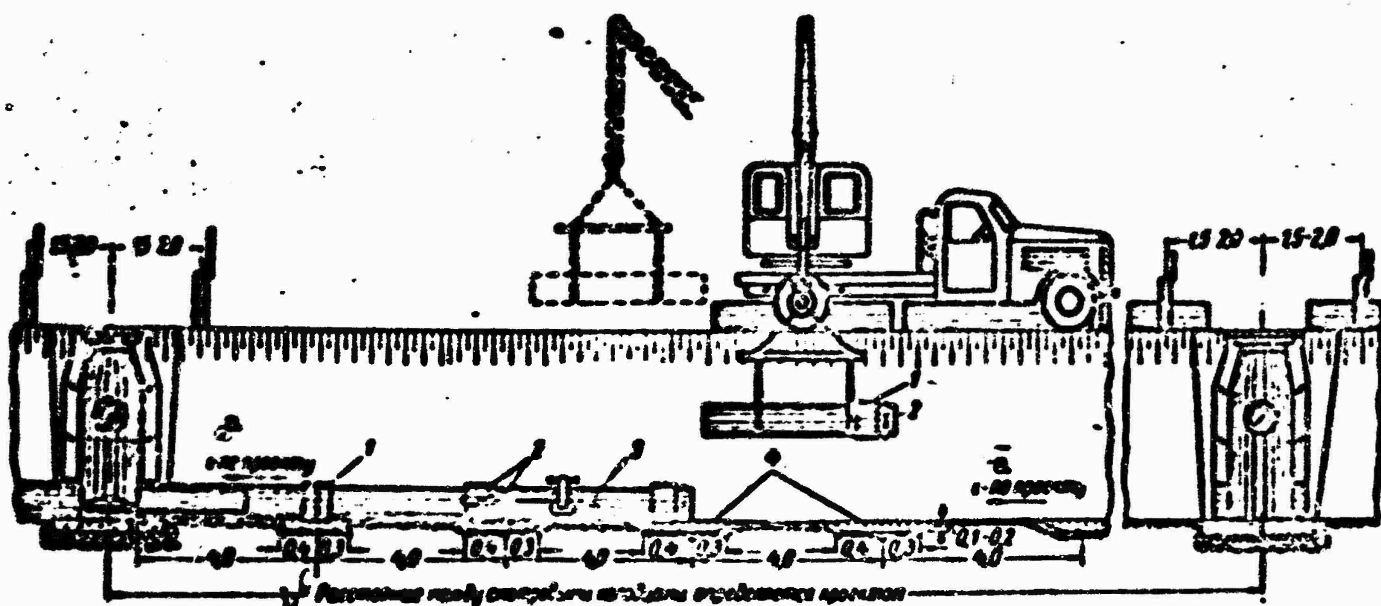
Lowering of a pipe into a trench by a truck crane (the trench walls are not braced). 1) Union; 2) rubber rings; 3) tightening screw jack; 4) holes for installing joints. a) According to design; b) the distance between access gulleys is determined by the design.
